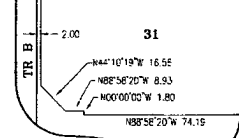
DETAIL-PRIVATE STORM DRAINAGE EASEMENT
